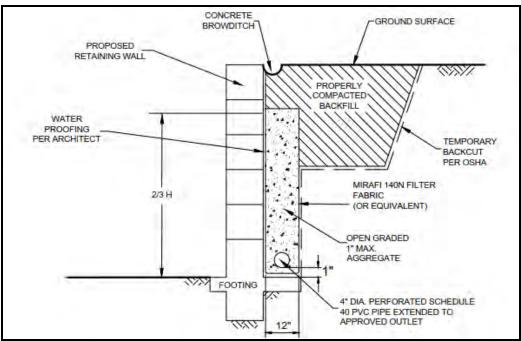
Conceptual Design for Retaining Wall Drainage
